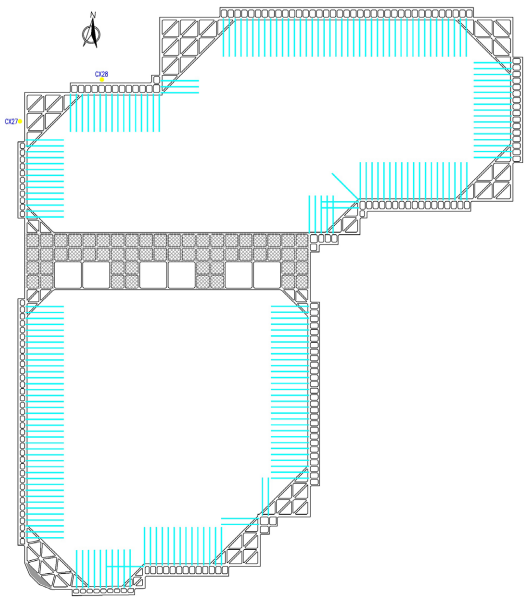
Support scheme of self-stabilizing foundation pit support structure
